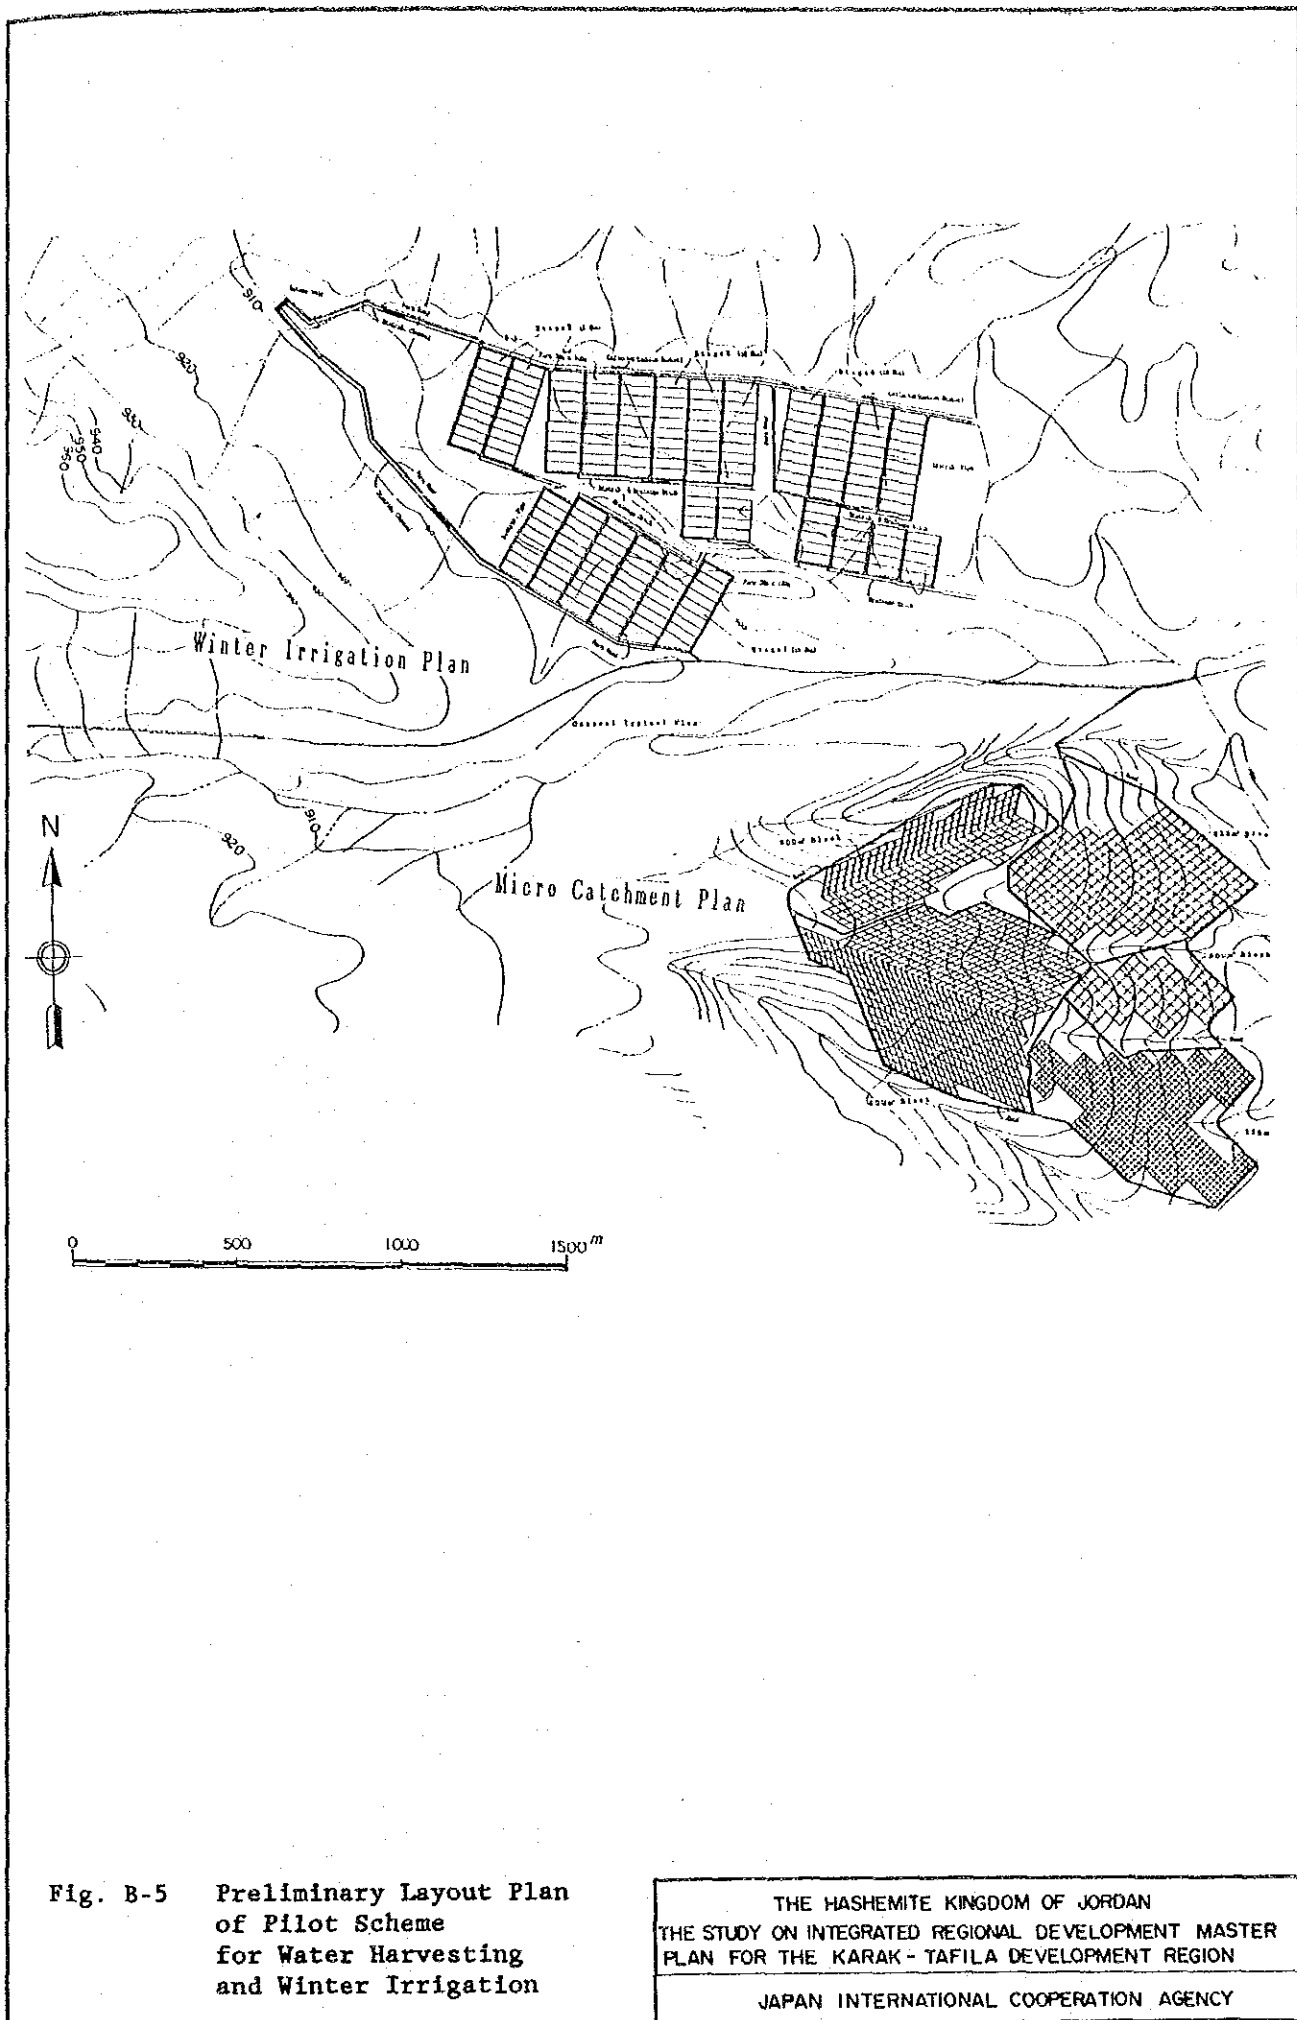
Preliminary Layout Plan of Pilot Scheme for Water Harvesting and Winter Irrigation
